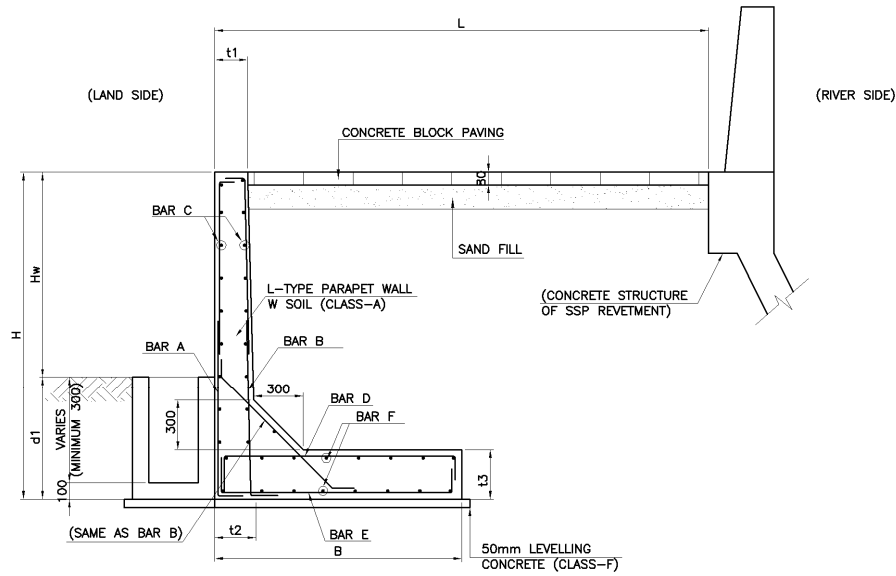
Typical Cross Section of L-type Parapet Wall-SE
